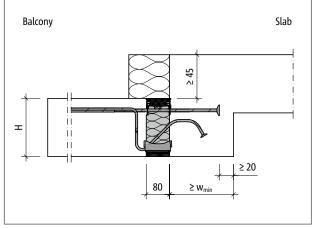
Schöck Isokorb® T type K-U: Balcony with height offset downwards and external insulation
